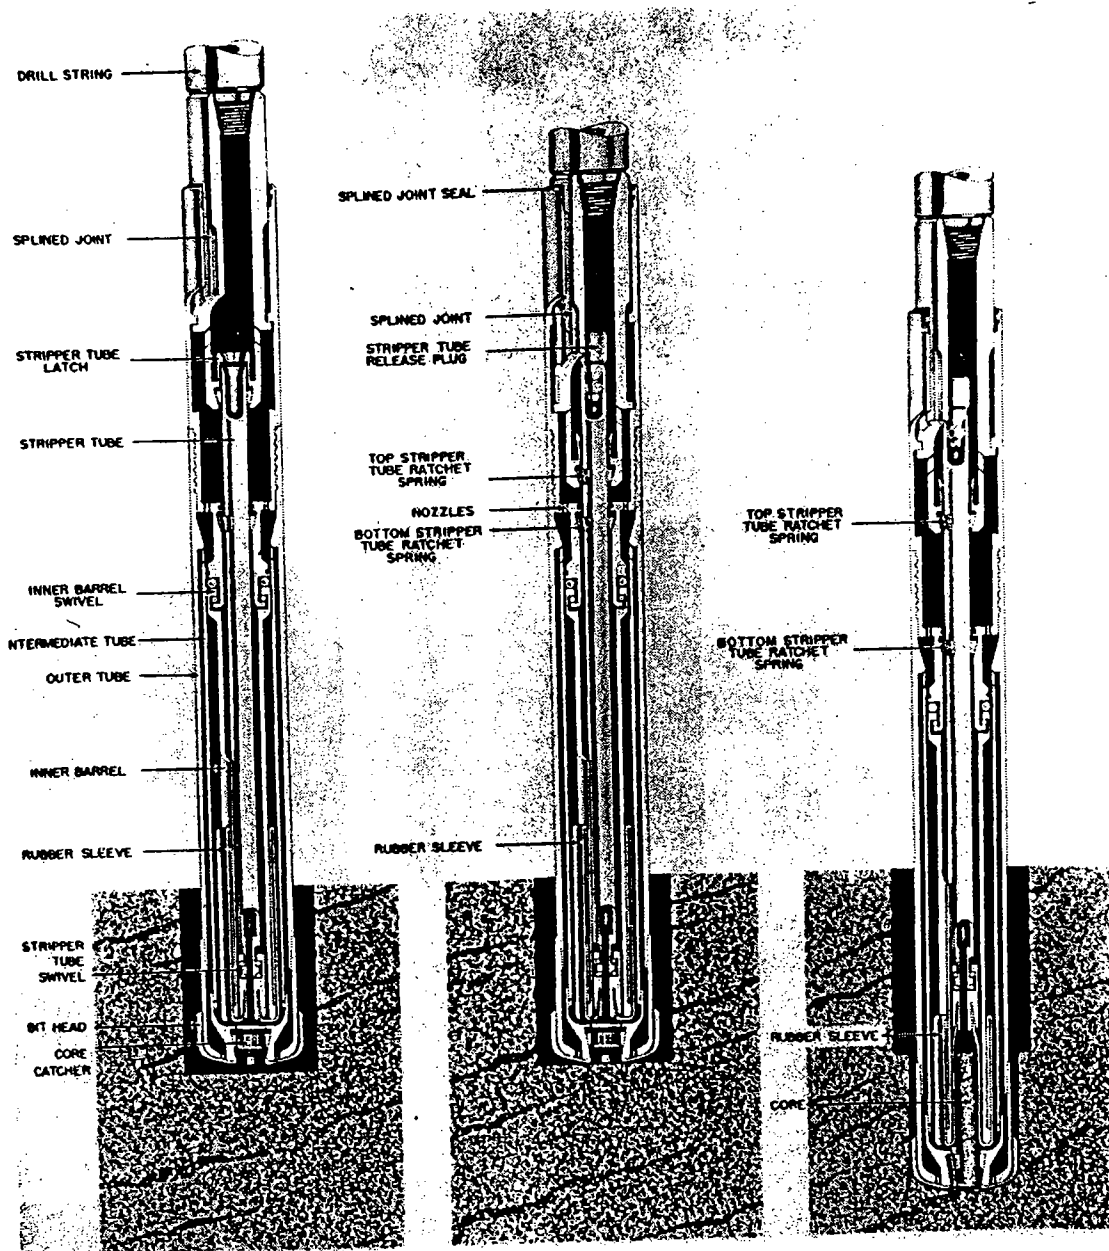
Rubber-sleeve core barrel. (1) Lowered to bottom of hole; (2) ready to cut core; (3) after cutting 2 ft of core. This tool is especially useful in soft or fractured formations. (Courtesy Christensen Diamond Products.)
